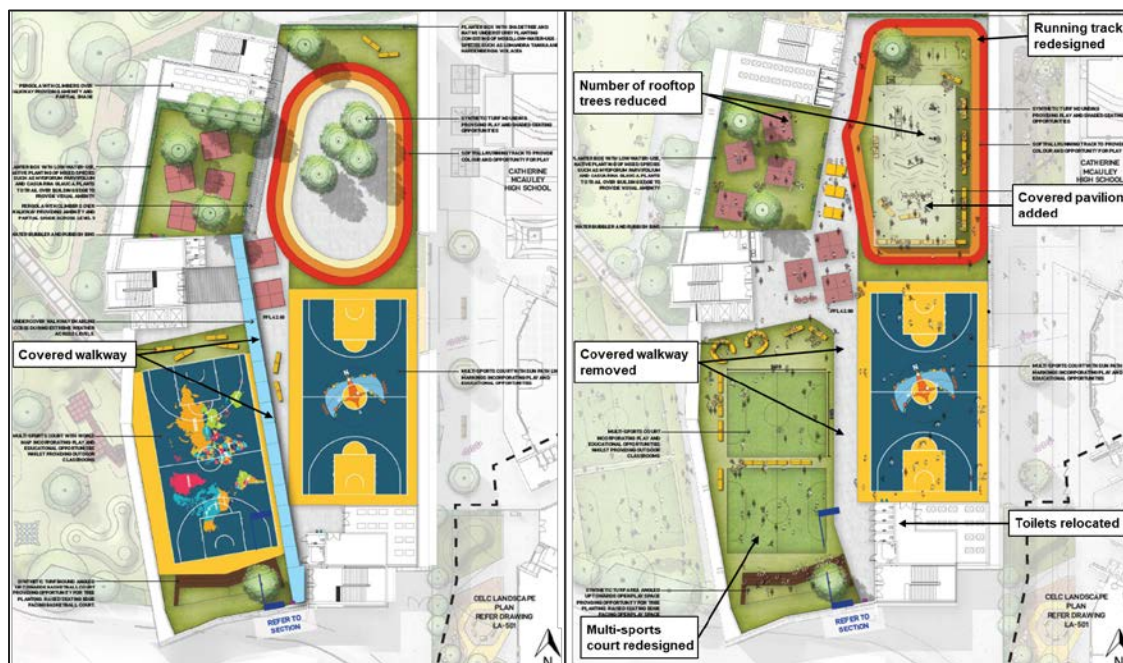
| Approved (left) and proposed (right) roof / level 5 landscaping layout and design (Base source Applicant's RtS 2023)
